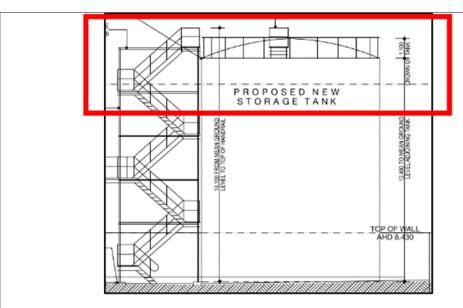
Side elevation of the proposed storage tank with the hight exceedance outlined in red (Source: extracted from the submitted plans).
